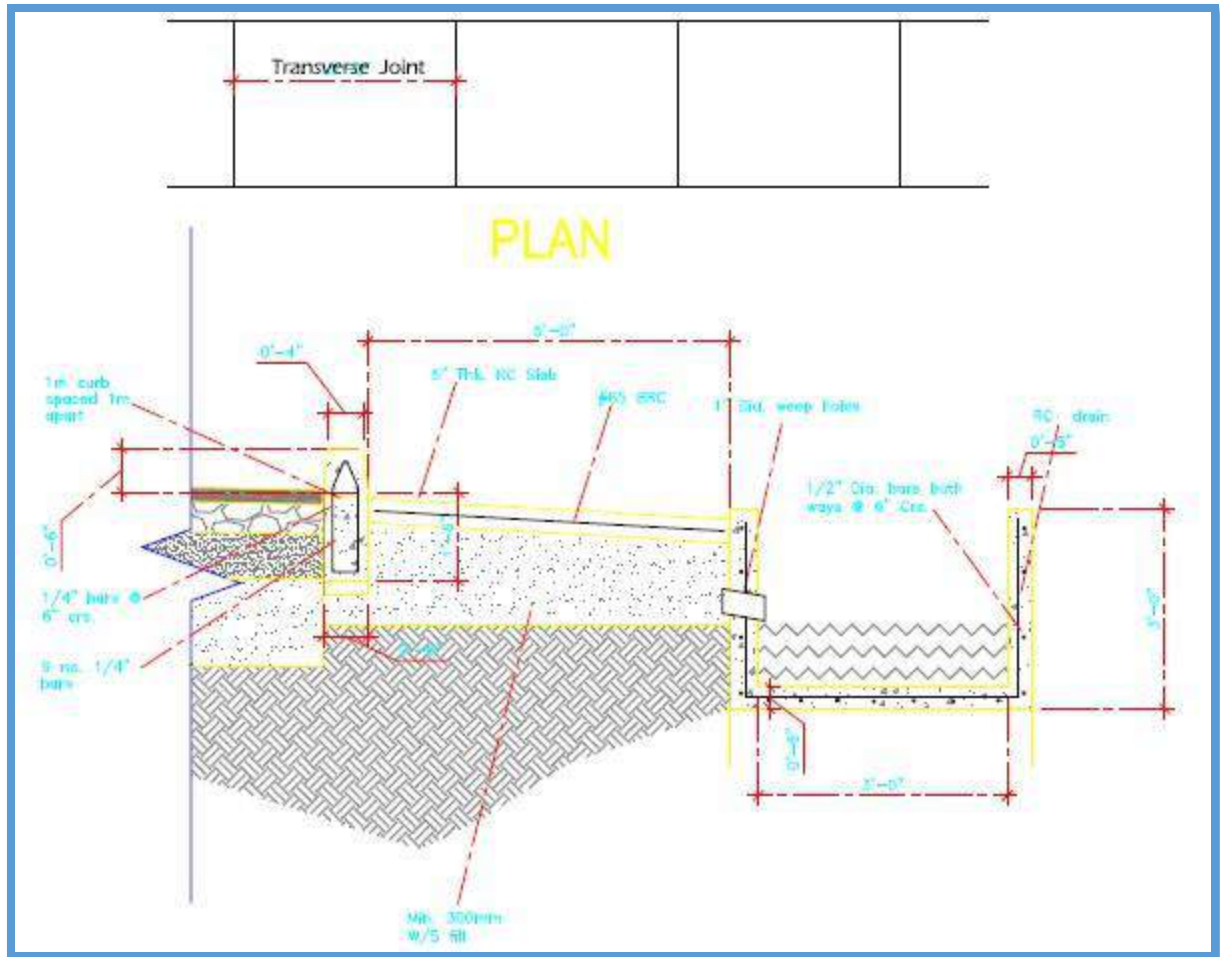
Cross Section of the Sidewalk and Reinforced Concrete Drain
